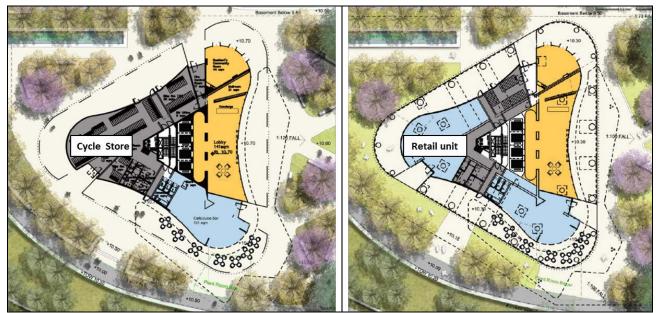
Approved (left) and proposed (right) ground floor layout (Base source: applicant's application)
